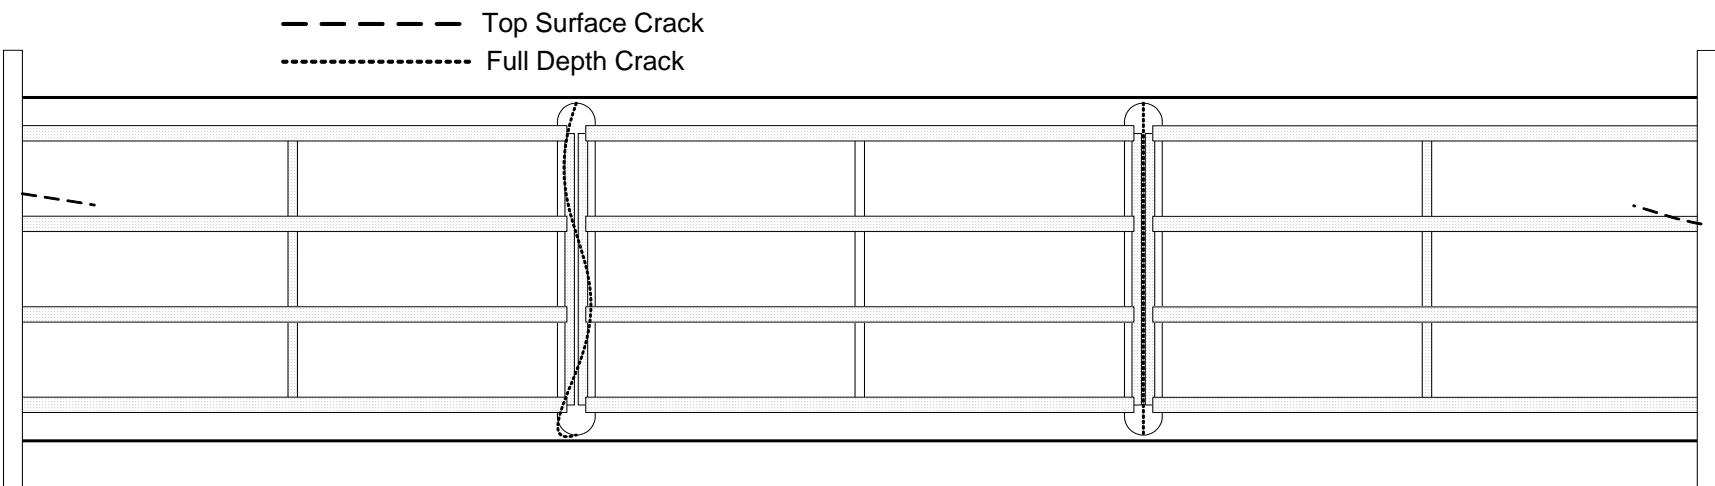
Detailed Map of Crack Survey on the HPC Bridge Deck
